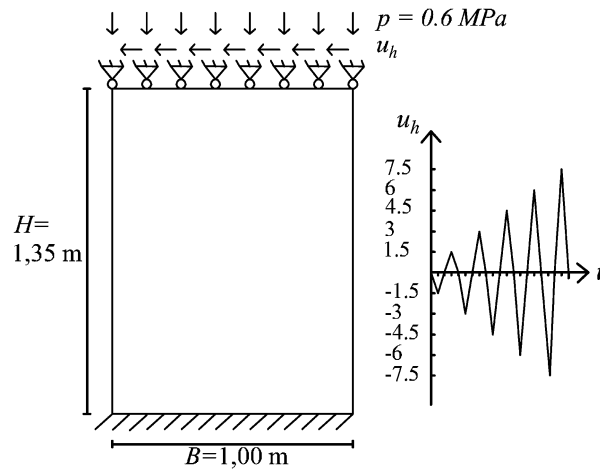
Geometry, boundary and loading conditions for the masonry shear wall.
